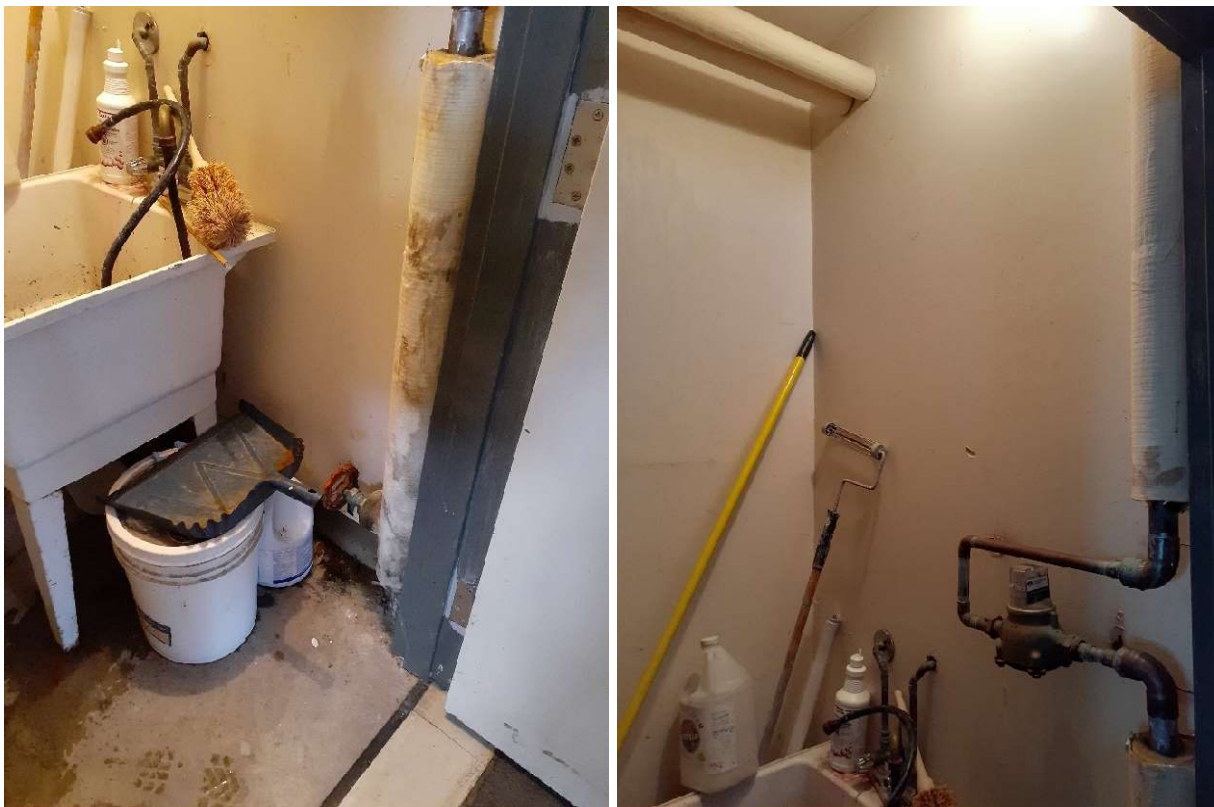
Representative photograph of the Mechanical Room in Building 138. Non-asbestos containing white caulking located at the seam between the floor and the wall [Sample ID: 138-AS-01A-C]. White paint on the wall [Sample ID: 138-LP-01; 362 ppm lead] and grey paint on the floor [Sample ID: 138-LP-02; 2,320 ppm lead] confirmed to contain high levels of lead.
